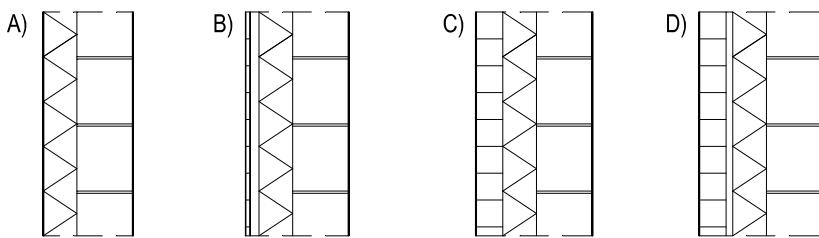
Examples of multi-layered external wall constructions (Source: own elaboration)
